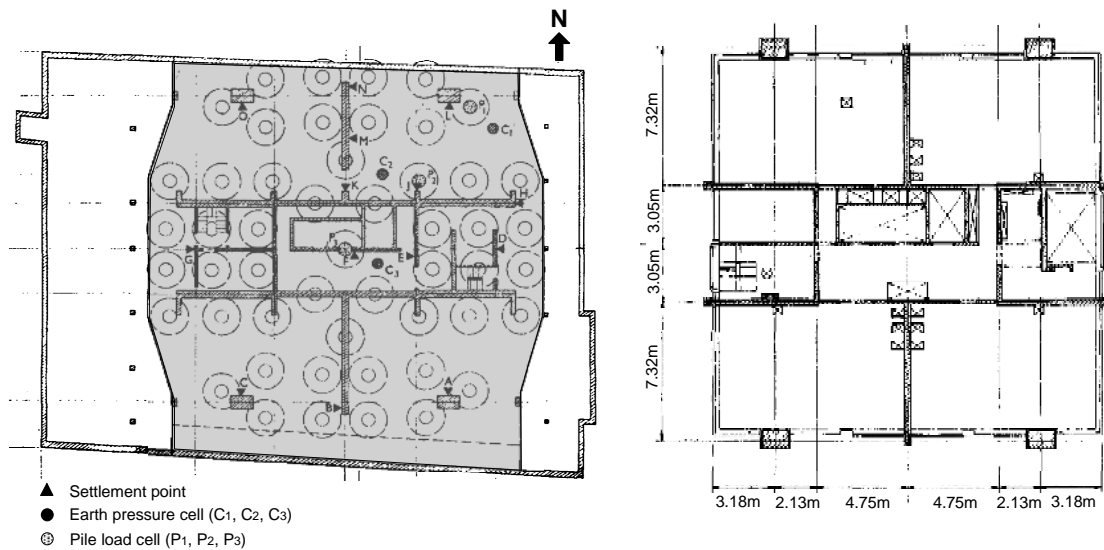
Foundation and superstructure layout of Hyde Park Cavalry Barracks (Hooper 1973)
